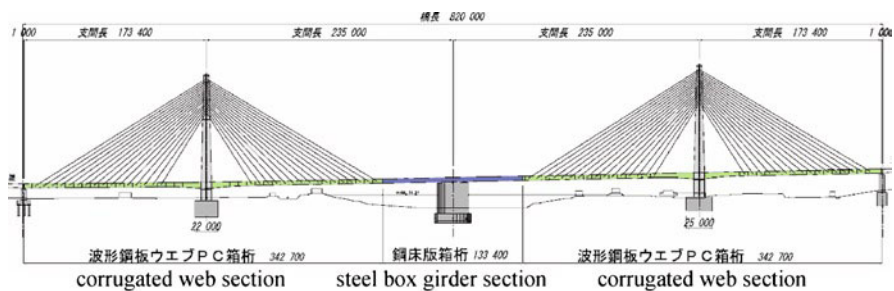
Extradosed bridge with corrugated steel web integrated by steel box girder.
